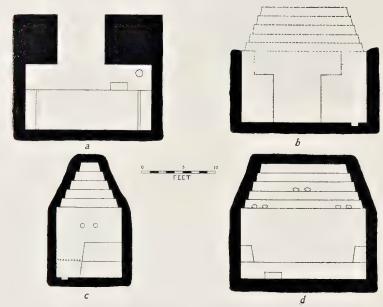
Structure R: details of northern room of western range. a, plan; b, western wall; c, northern end; d, eastern wall.
